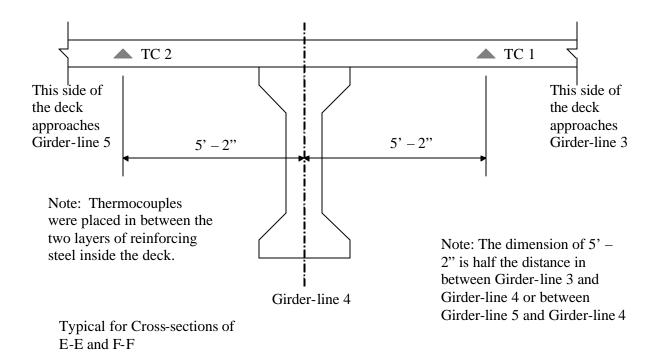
Installed Thermalcouples In Each Deck Cross-Sectional Location
